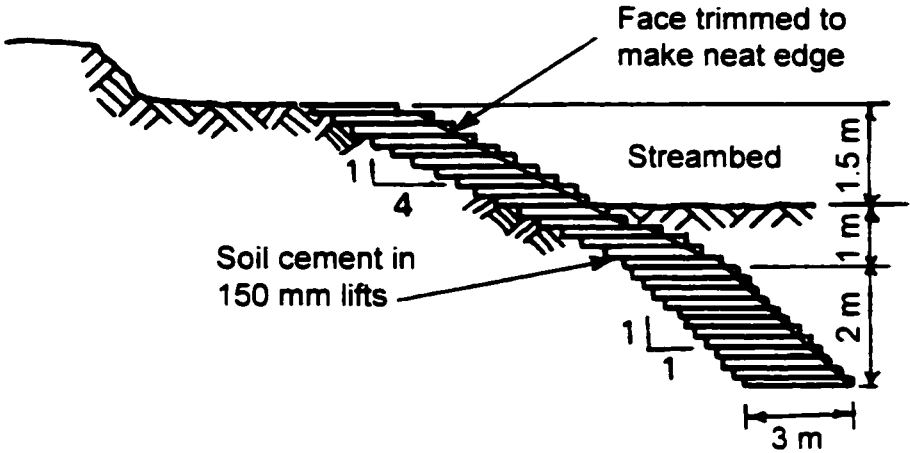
Typical section of soil cement bank protection (Petersen, 1986).
